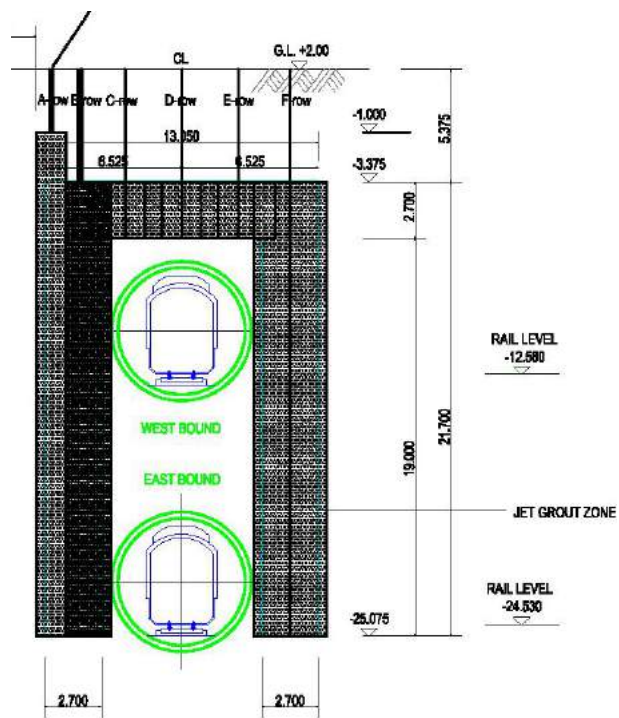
Crosssection view of jet grouting wall at the Saigon Opera House location (Vu et al., 2021).
